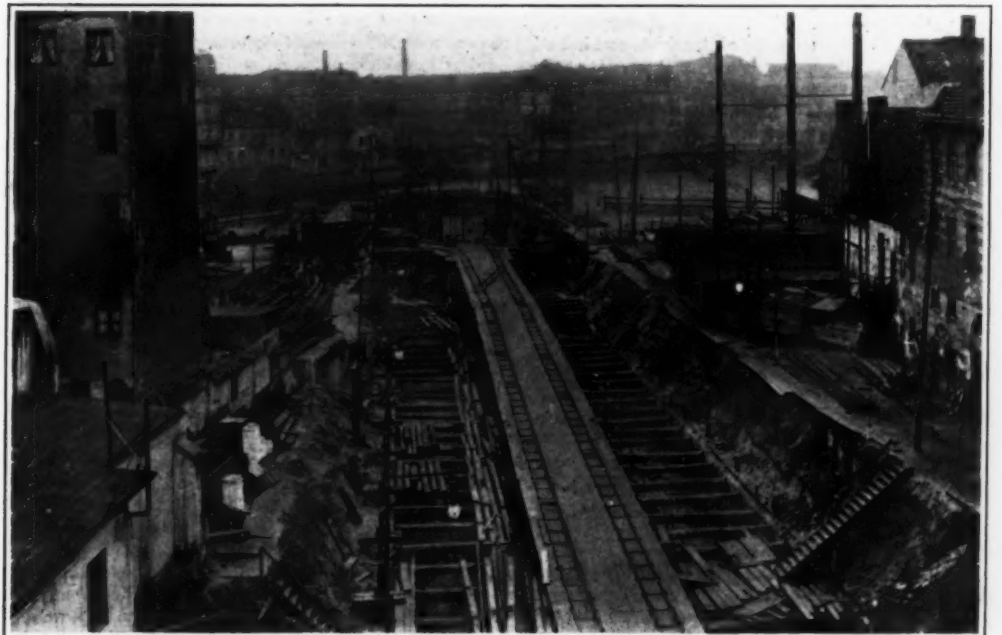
Open Pit Leading to the Second Half of the Tunnel, December 12, 1911.
